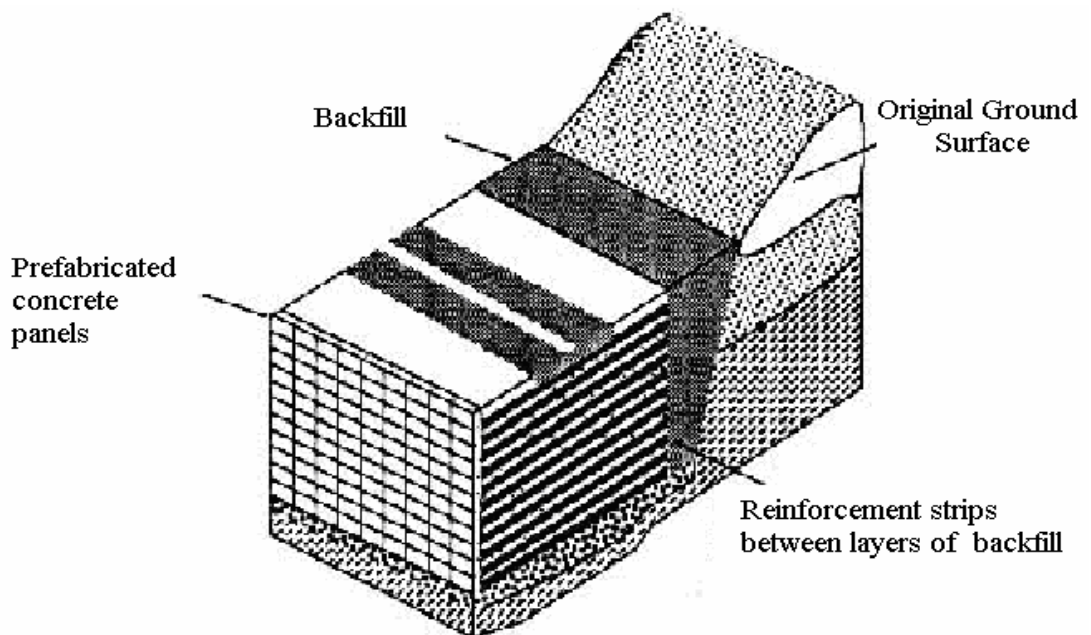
Components of Reinforced Earth Retaining Wall (Das, 1987)
